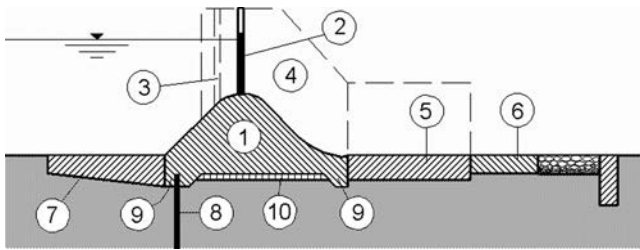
Schematic presentation of cross-section of a concrete dam on soil foundation.
